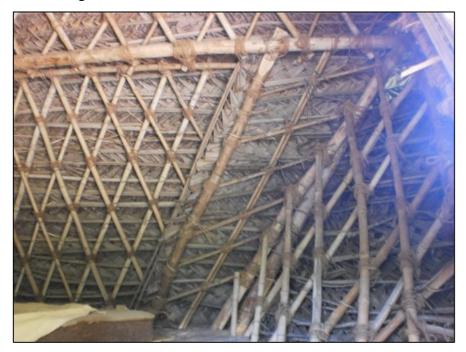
Roof detail of a Sri Ma house base plane (Auroville, India) showing the overhead framing. The elements are tied together using ropes made of natural fibres (www.auroville.org).
